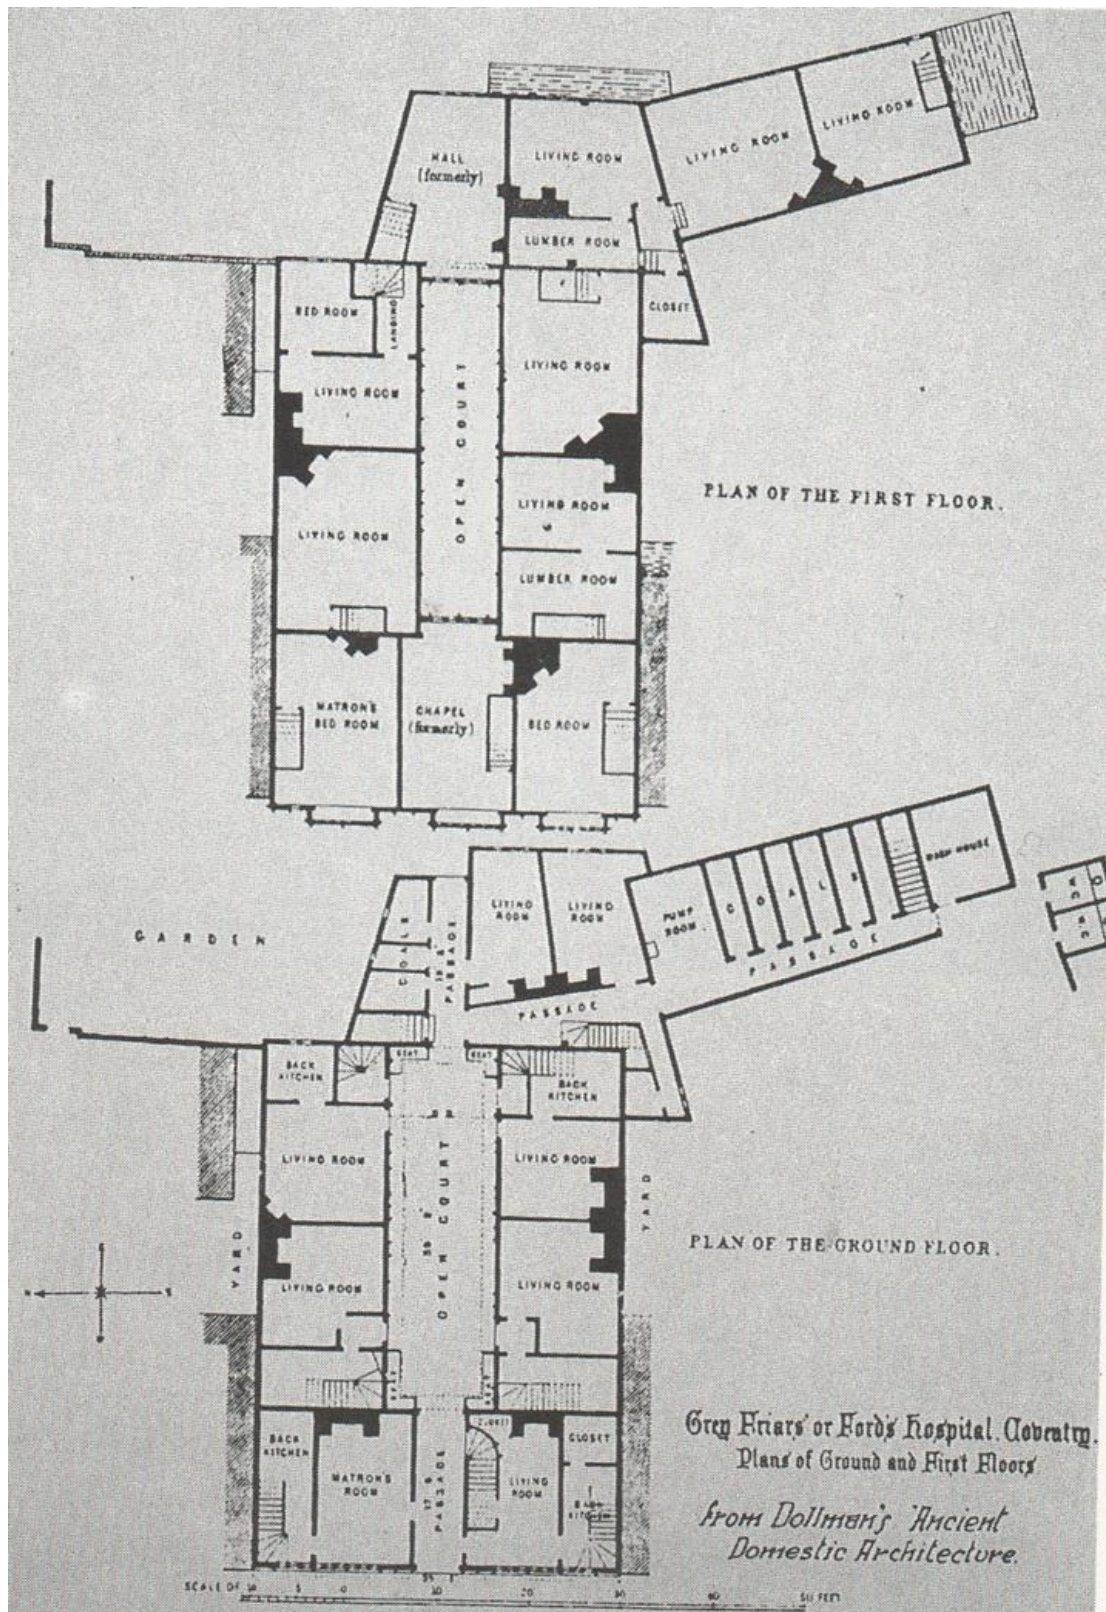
51: A plan of Ford's Hospital, Coventry. Top: First floor plan; Below: Ground floor plan. The site was very small, but in this case the chapel was located at the west on the first floor, looking into the courtyard. From Francis T. Dollman 1858, *Ancient Domestic Architecture
